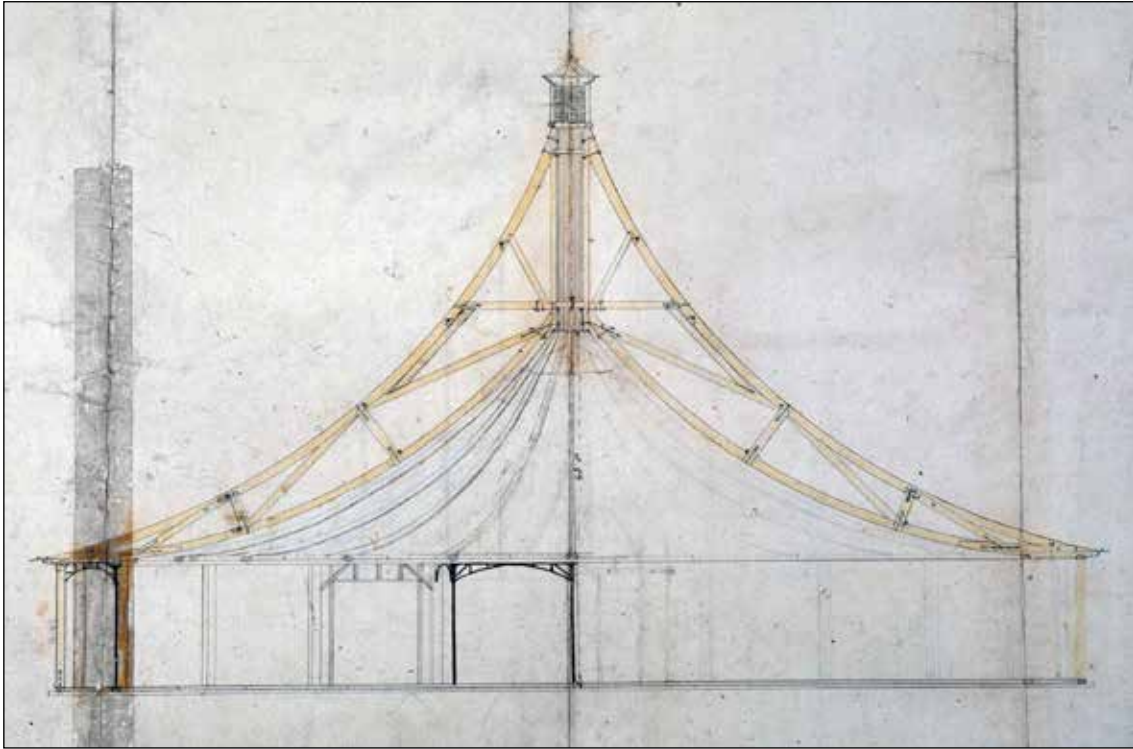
Section of Nash's 'tent room' (Rotunda) at Carlton House, May 1814. This image shows the roof structure and the suspended canvas ceiling below. (The National Archives, ref. WORK 43/575; colour-adjusted)
